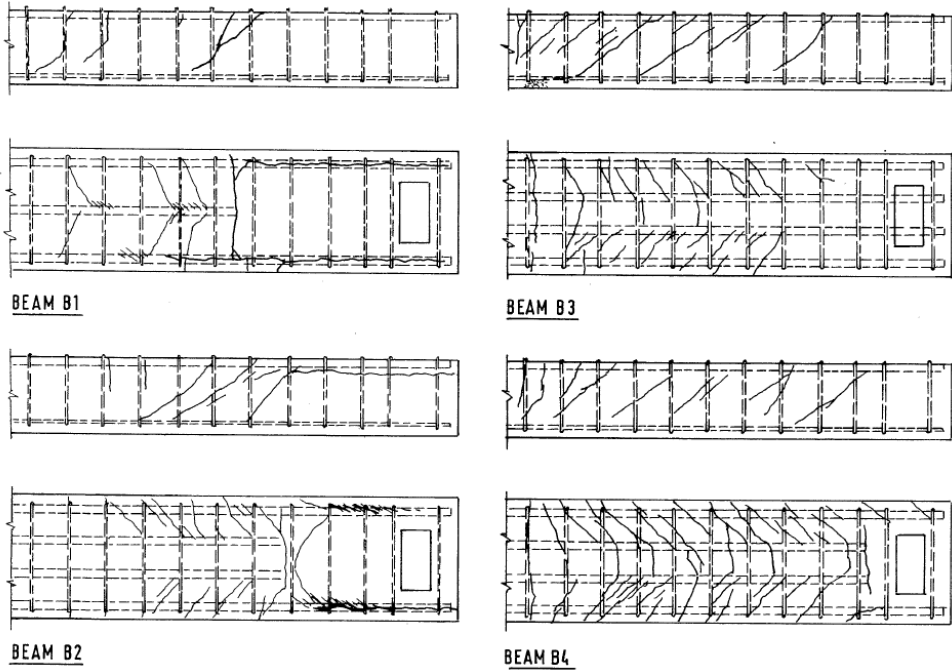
Tests Series B: Crack patterns of the four beams.B
